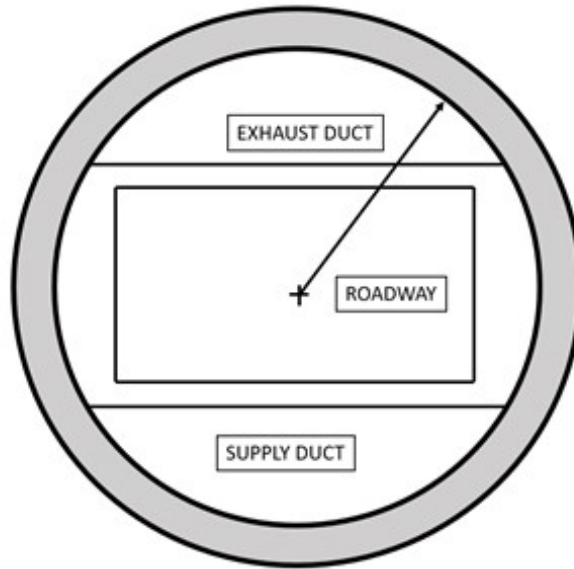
Tunnel with transverse ventilation showing ducts.
